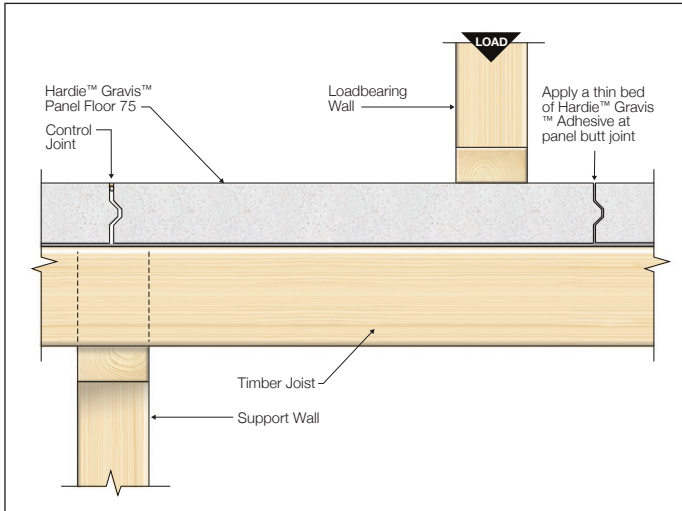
CONTROL JOINT LOCATION FOR LOAD BEARING WALL
